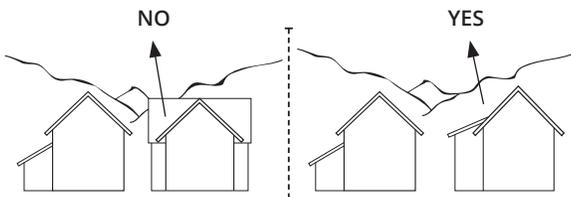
Use building forms and maintain spacing between buildings that respect existing views, open space and solar access.
